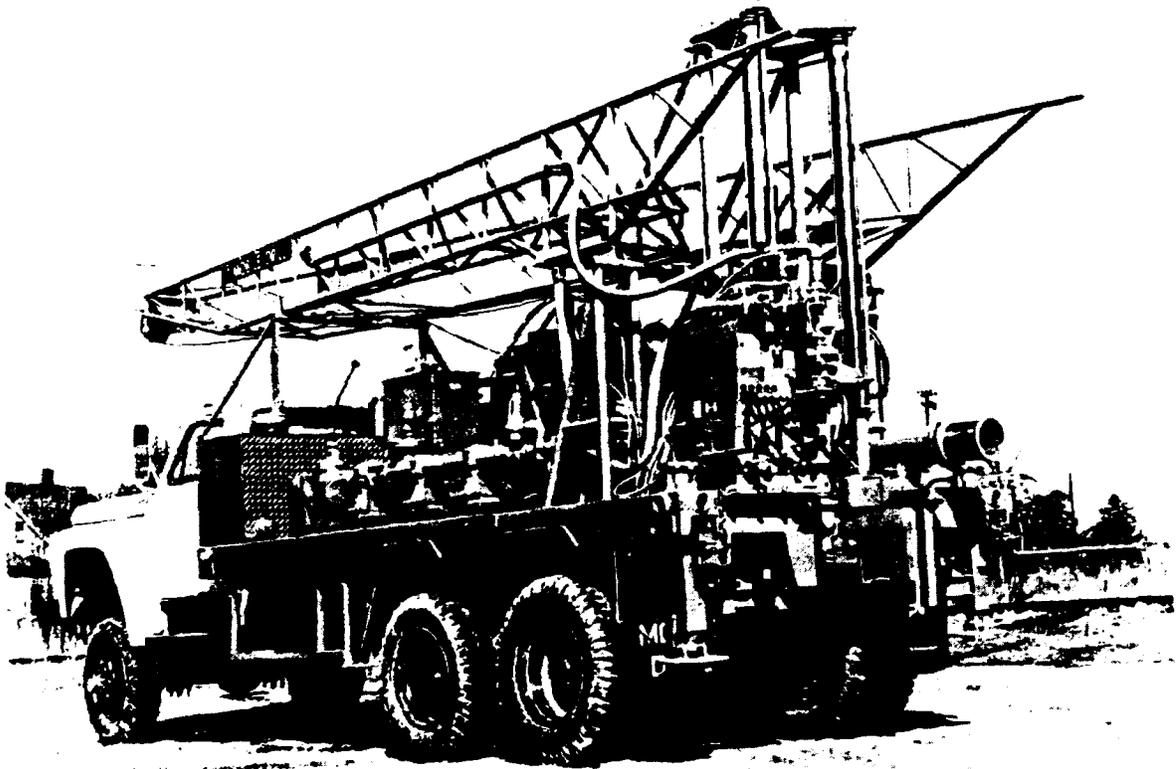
Typical truck-mounted drill rig (permission by Mobile Drilling Company)
